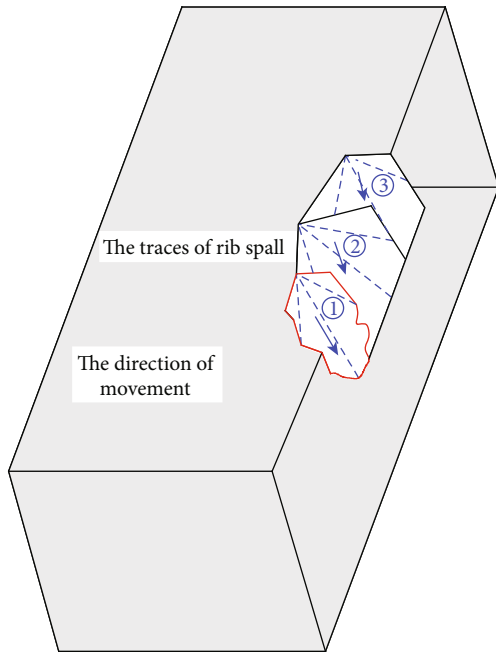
Rib spalling traces of the coal wall.
